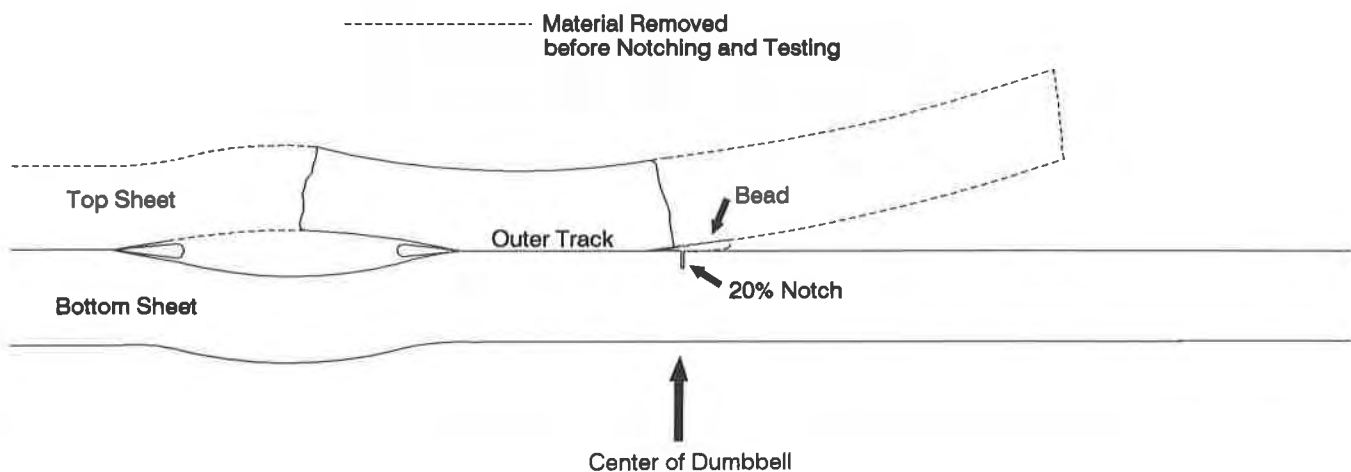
Cross section of notched stress rupture specimen from a double track fusion seam showing a side-view of the notch location.
